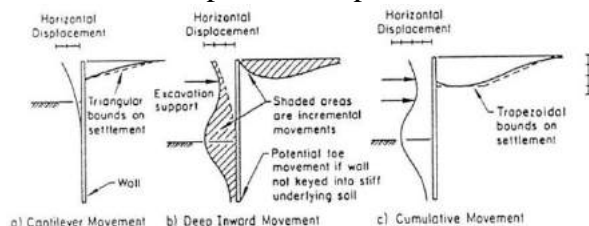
Typical Wall Deflection and Ground Movement of Excavation, Clough & O'Rourke (1990).
